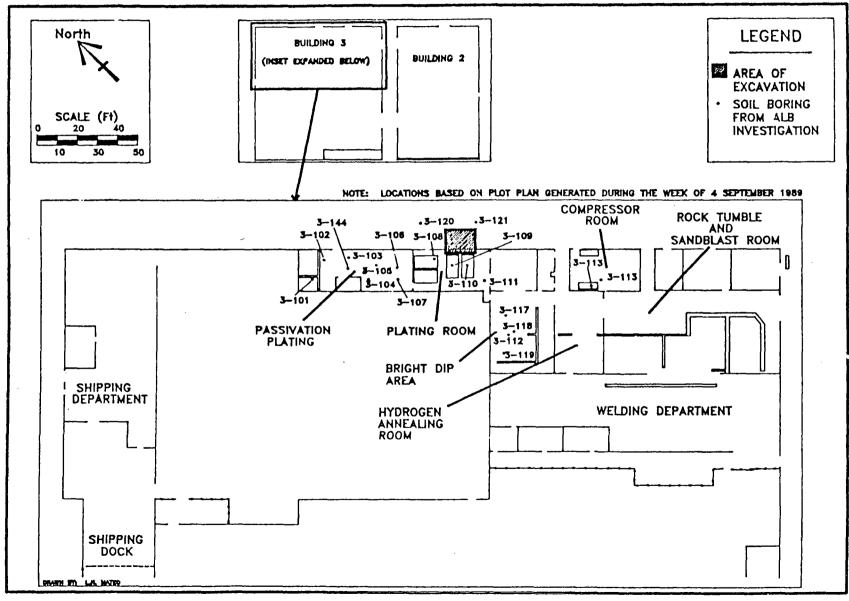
LOCATION OF PREVIOUS SOIL BORINGS IN BUILDING 3
